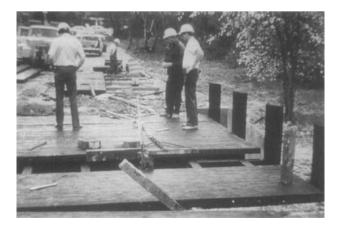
Doweled glulam panels were field assembled to construct deck of all-timber bridge.
